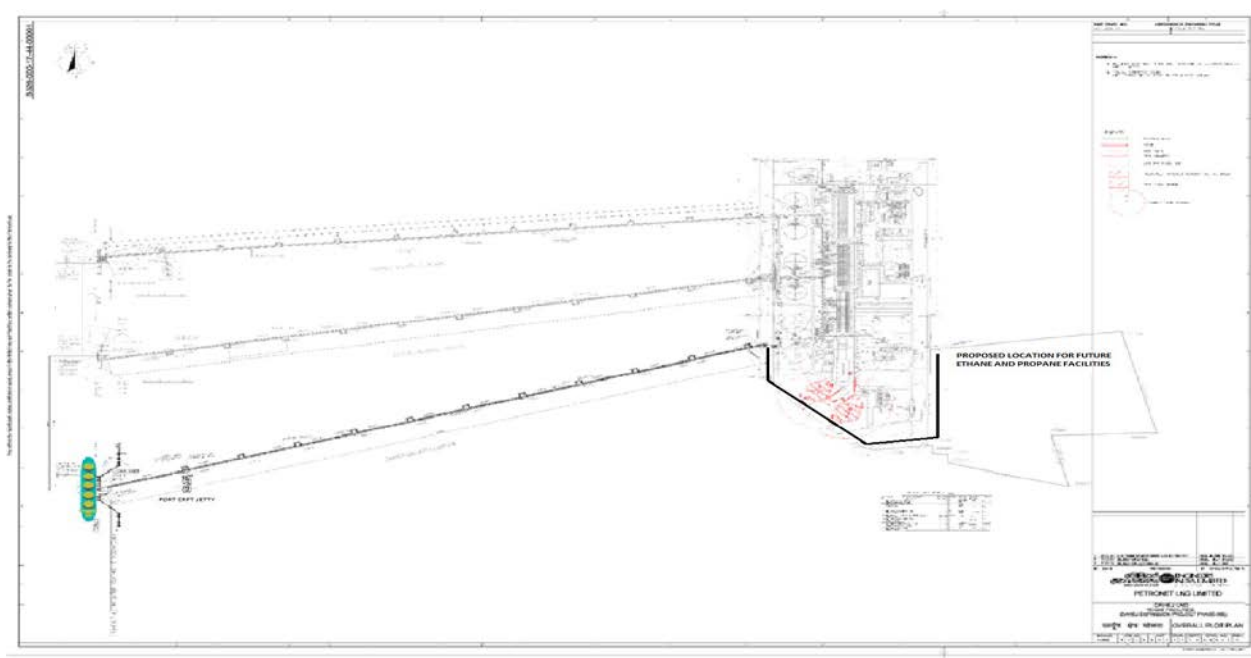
Layout Plan & Transfer Pipeline Alignment
